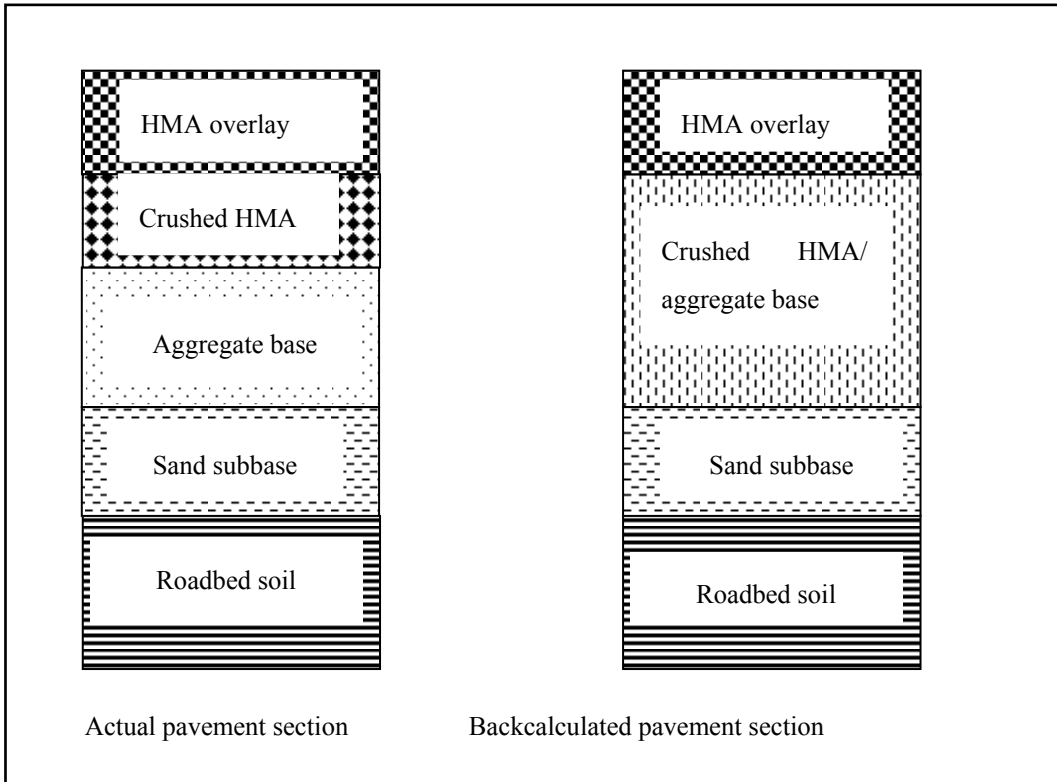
Pavement cross-sections for flexible pavements with a crushed asphalt layer
